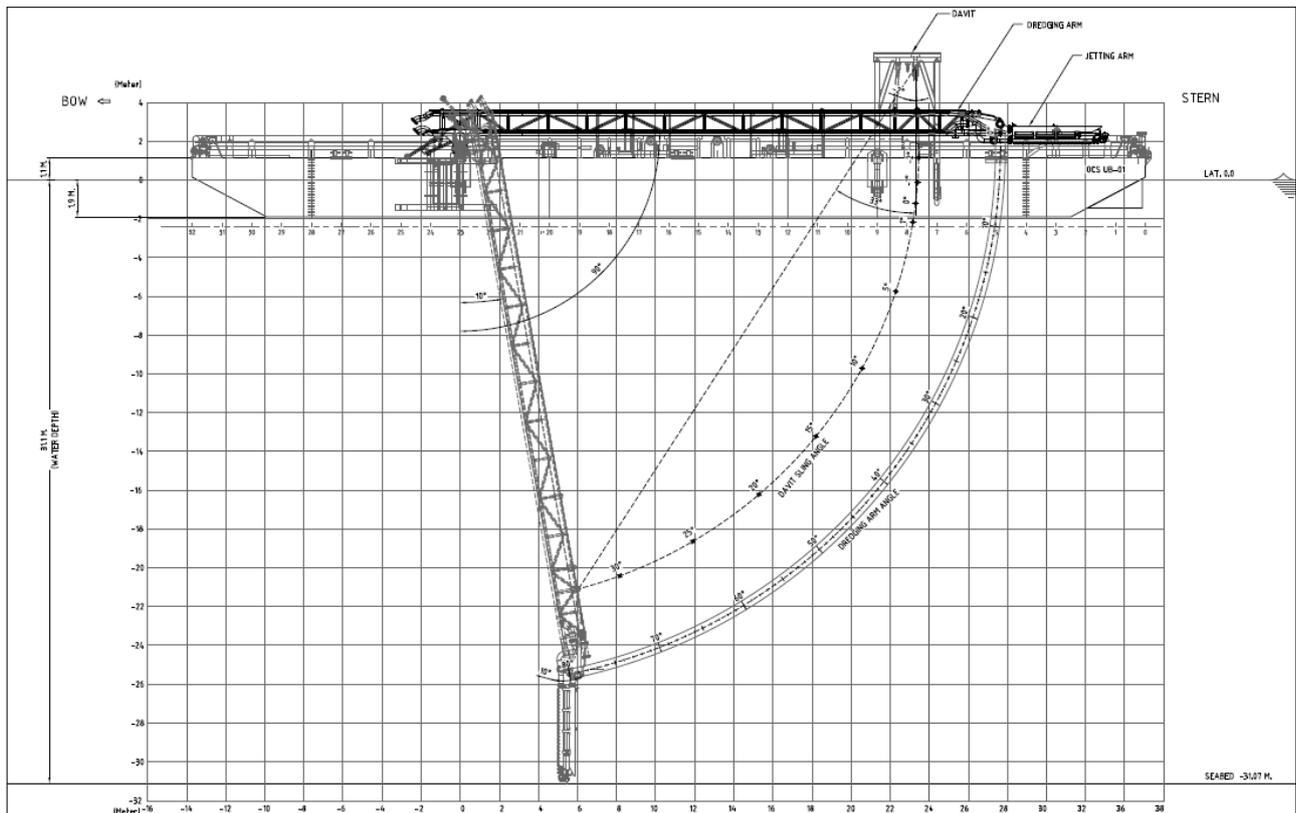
Trailing Arm with jetting arm configuration for post trenching
